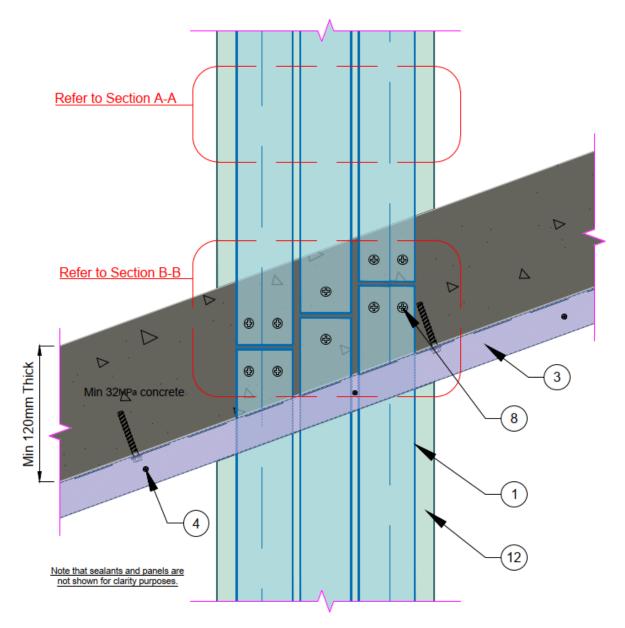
Dual void box riser – mid-wall connection to stair stringer
